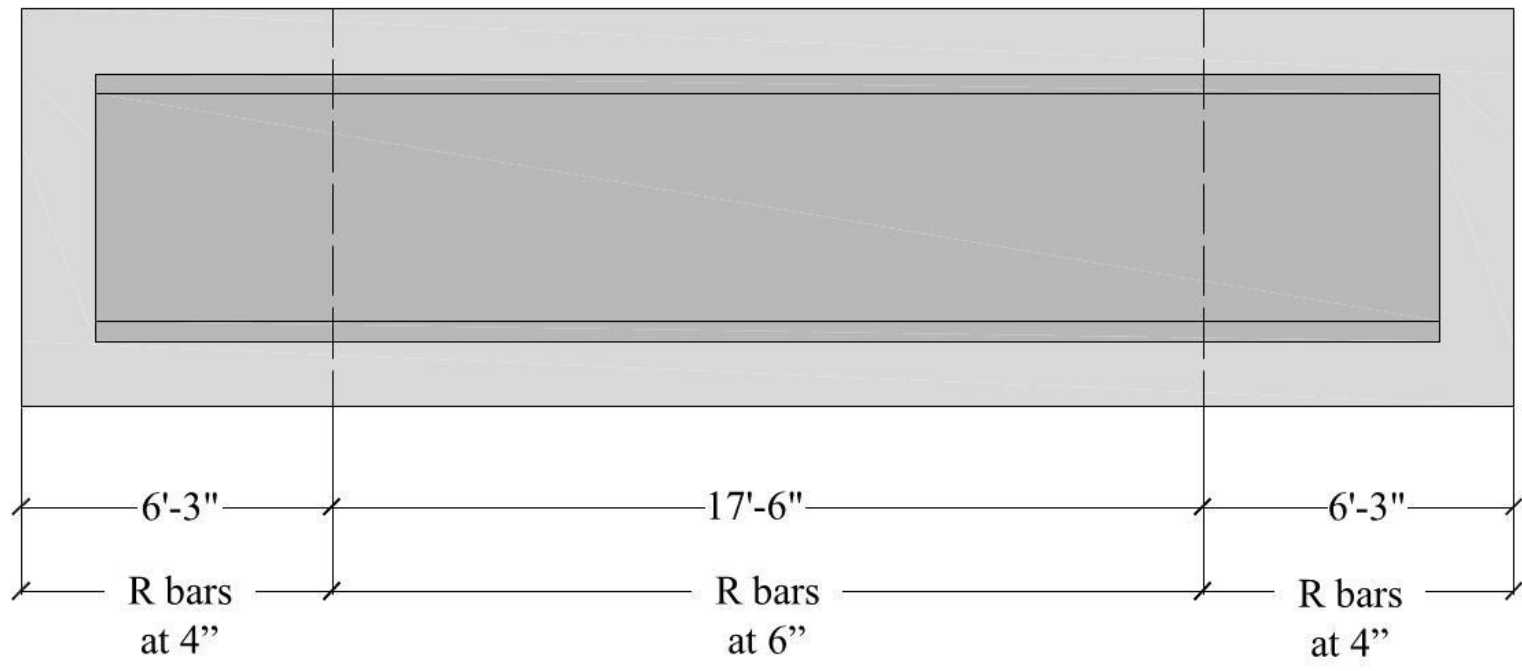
Beam 3 primary shear reinforcement (R bars) layout
